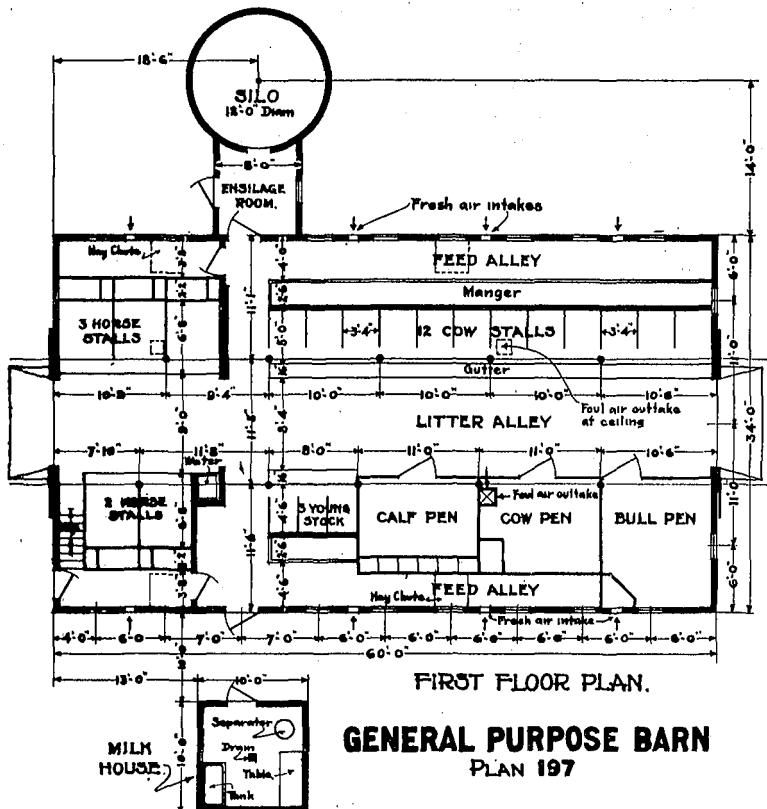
General Purpose Barn, 34x60 Feet, Plan 197
